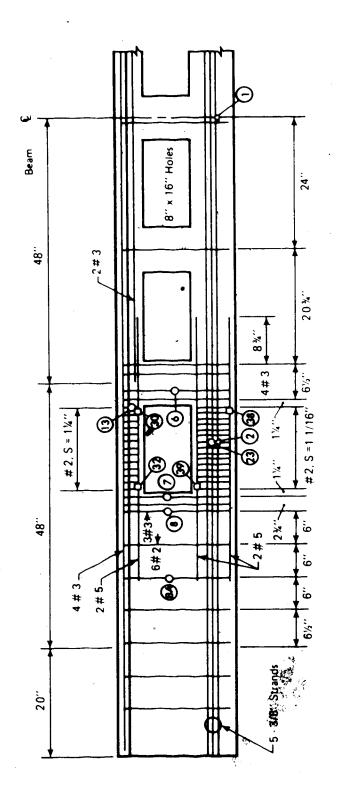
Reinforcement Details and Strain Gage Locations for Beam 27–16–4
